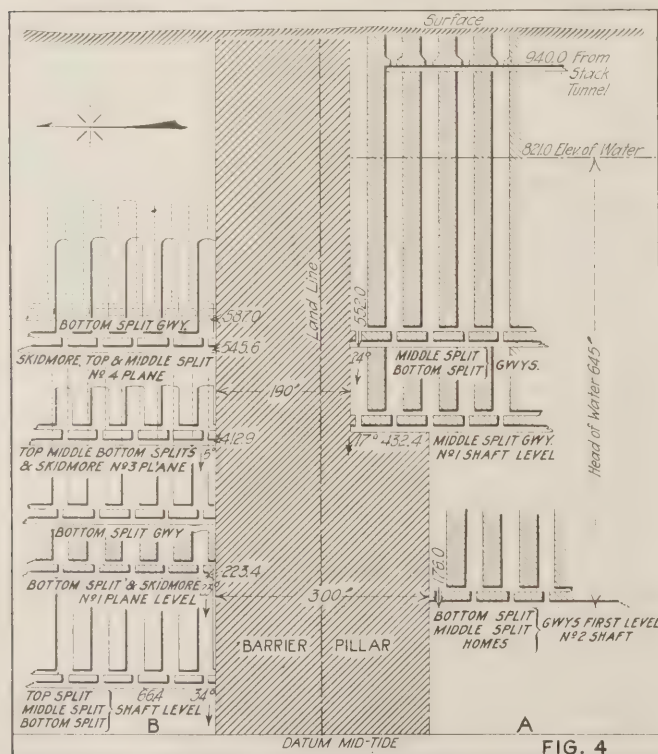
LONGITUDINAL SECTION OF A BARRIER BETWEEN TWO ADJOINING MINES
